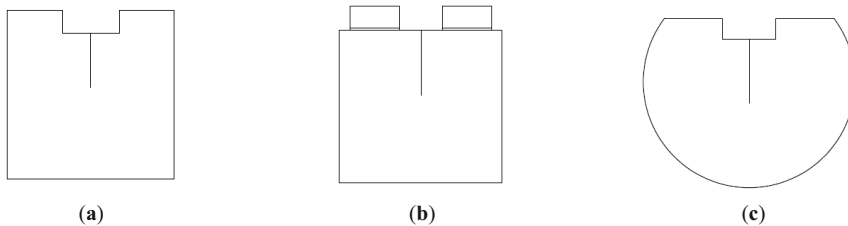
The scheme of test specimens used for WST: cubical specimen with precast or cut-out groove (a), cubical specimen with the groove made by glueing two plates on the top (b), and cylindrical specimen cut-out from the drilled core (c)
